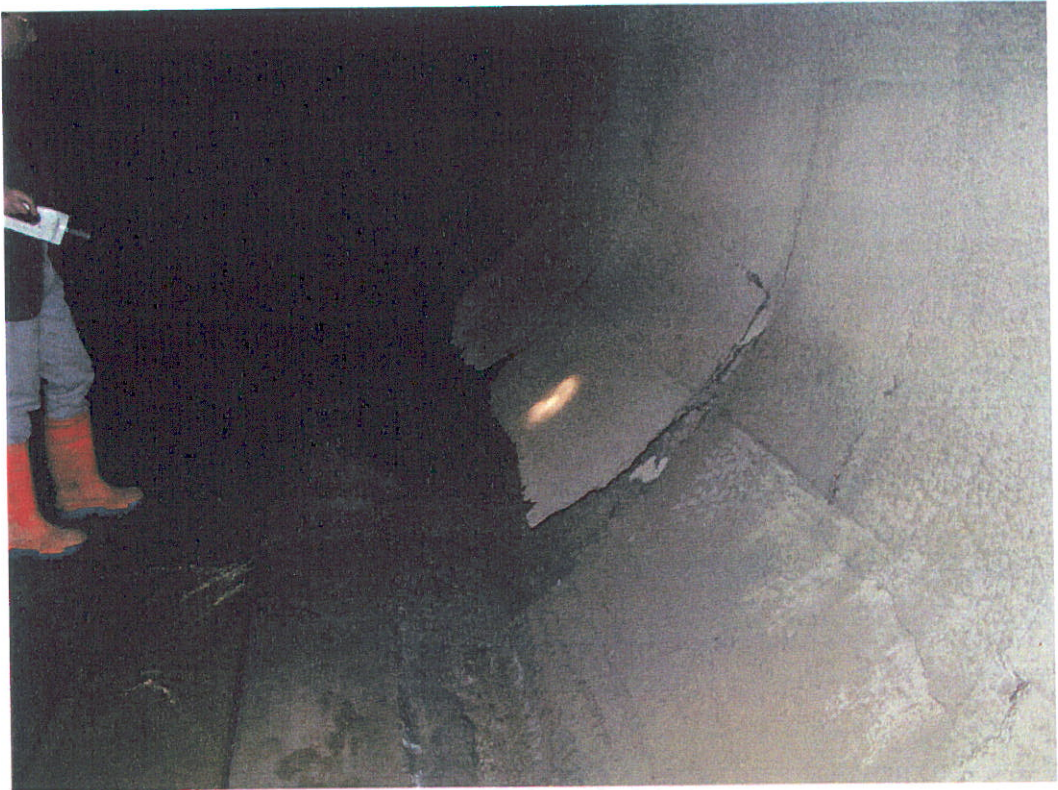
Shear failure of the shotcrete lining of the pilot tunnel
